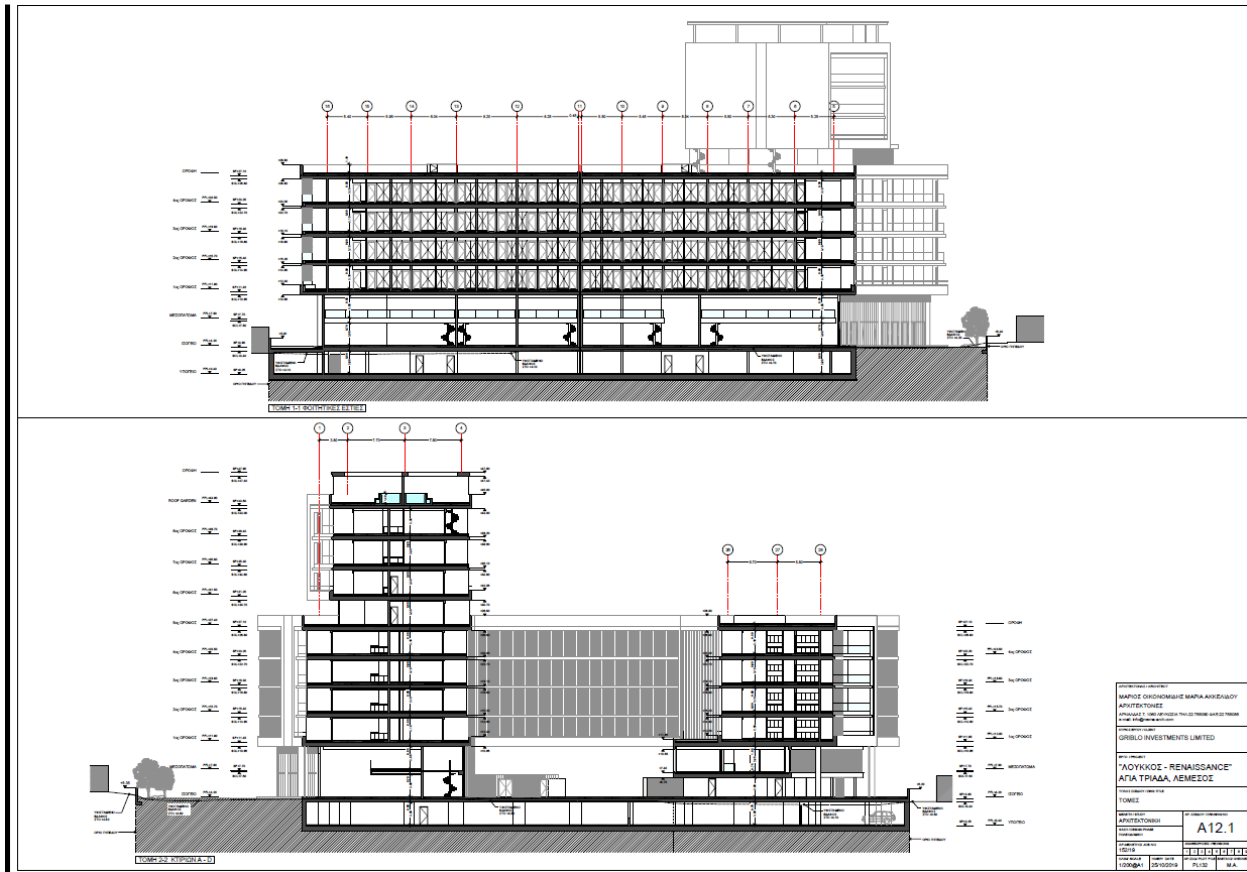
Building Cross Sections (Οικονομιδης-Ακκελίδου Architects)
